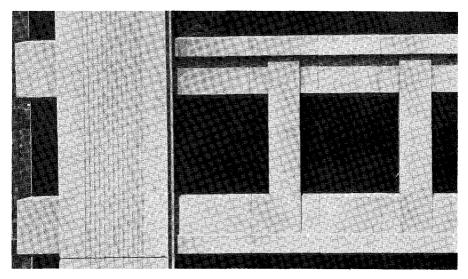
Closeup of architectural precast concrete finish of Vierendeel truss. The surface was lightly sandblasted.
